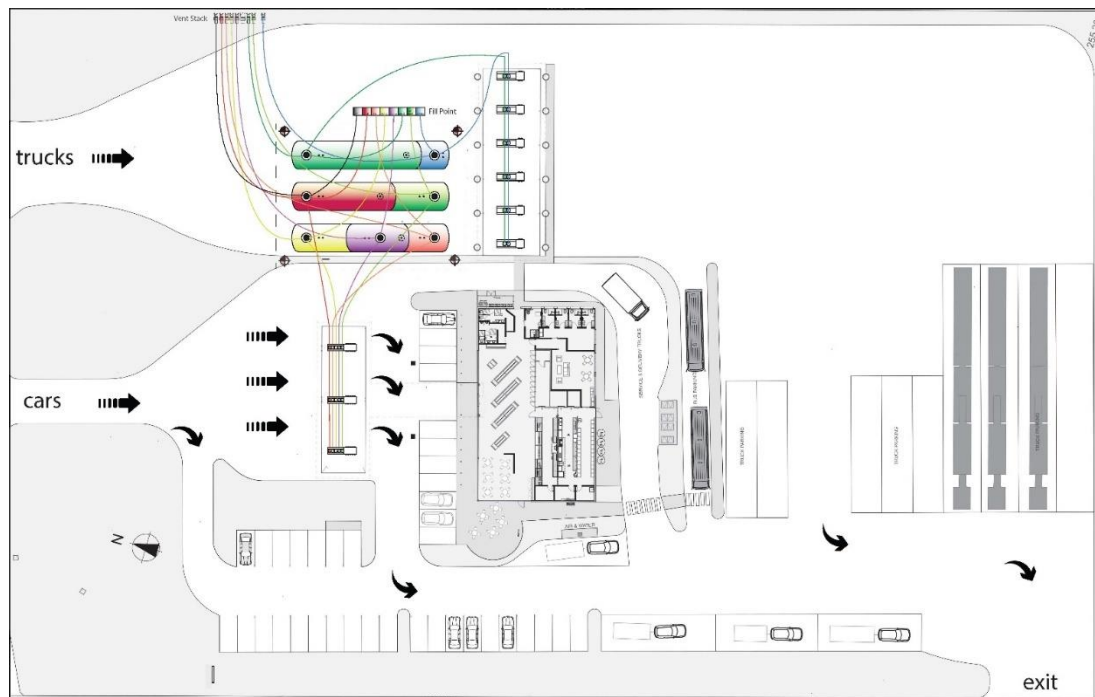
Site Plan & Facility Layout (see Appendix 1 for enlarged image).
